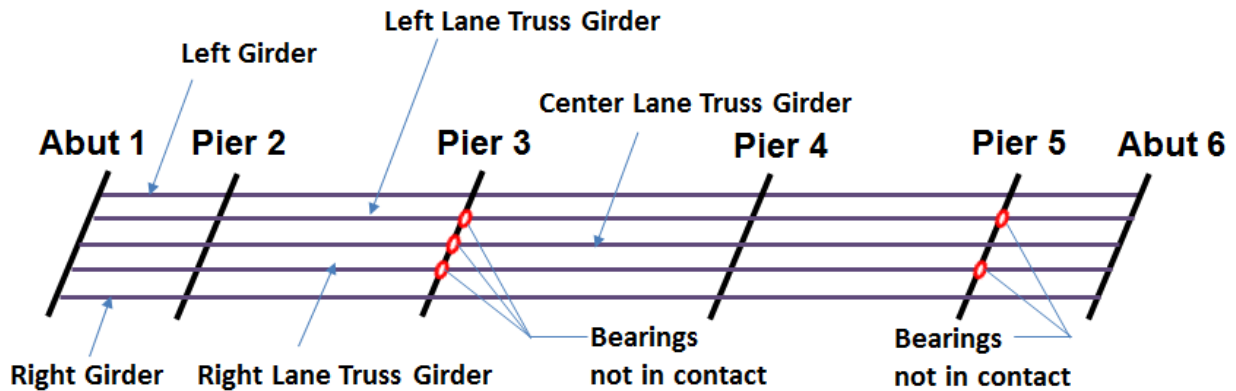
Plan view: Bearings that are not in contact with masonry plates
